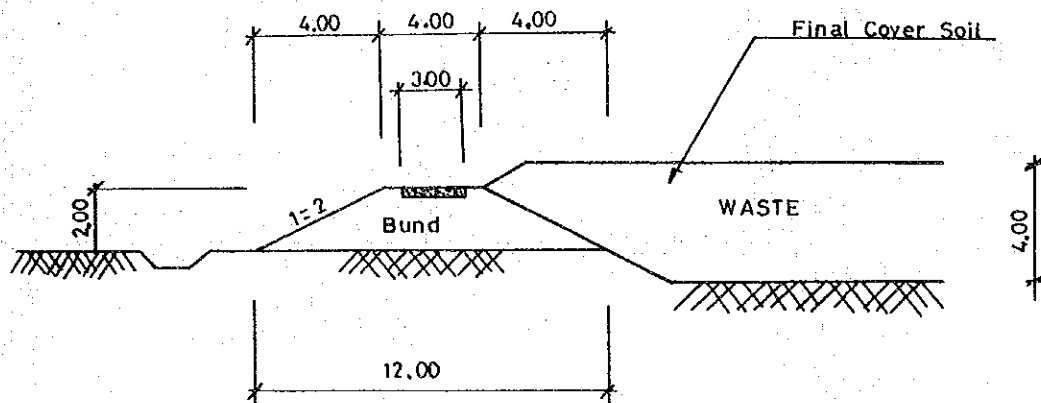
Typical Cross Section of Enclosing Bund
